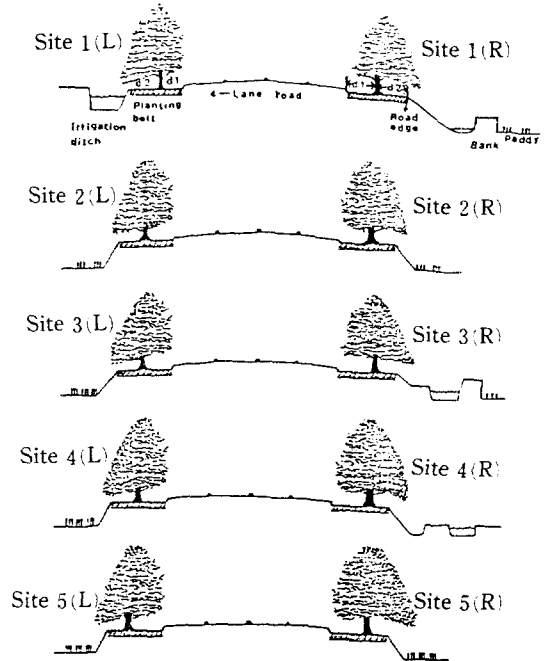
Cross section of road at each sampling site showing surrounding feature for tree.
